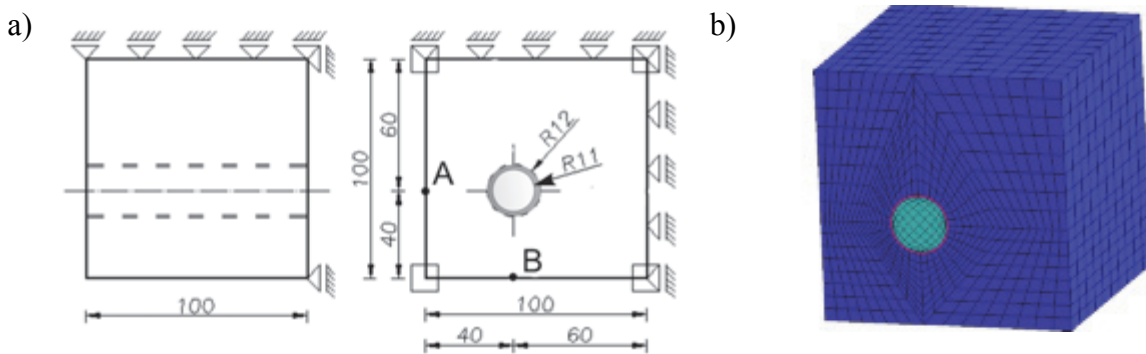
The model of the reinforced concrete test specimen: a) static scheme, b) FEM model
